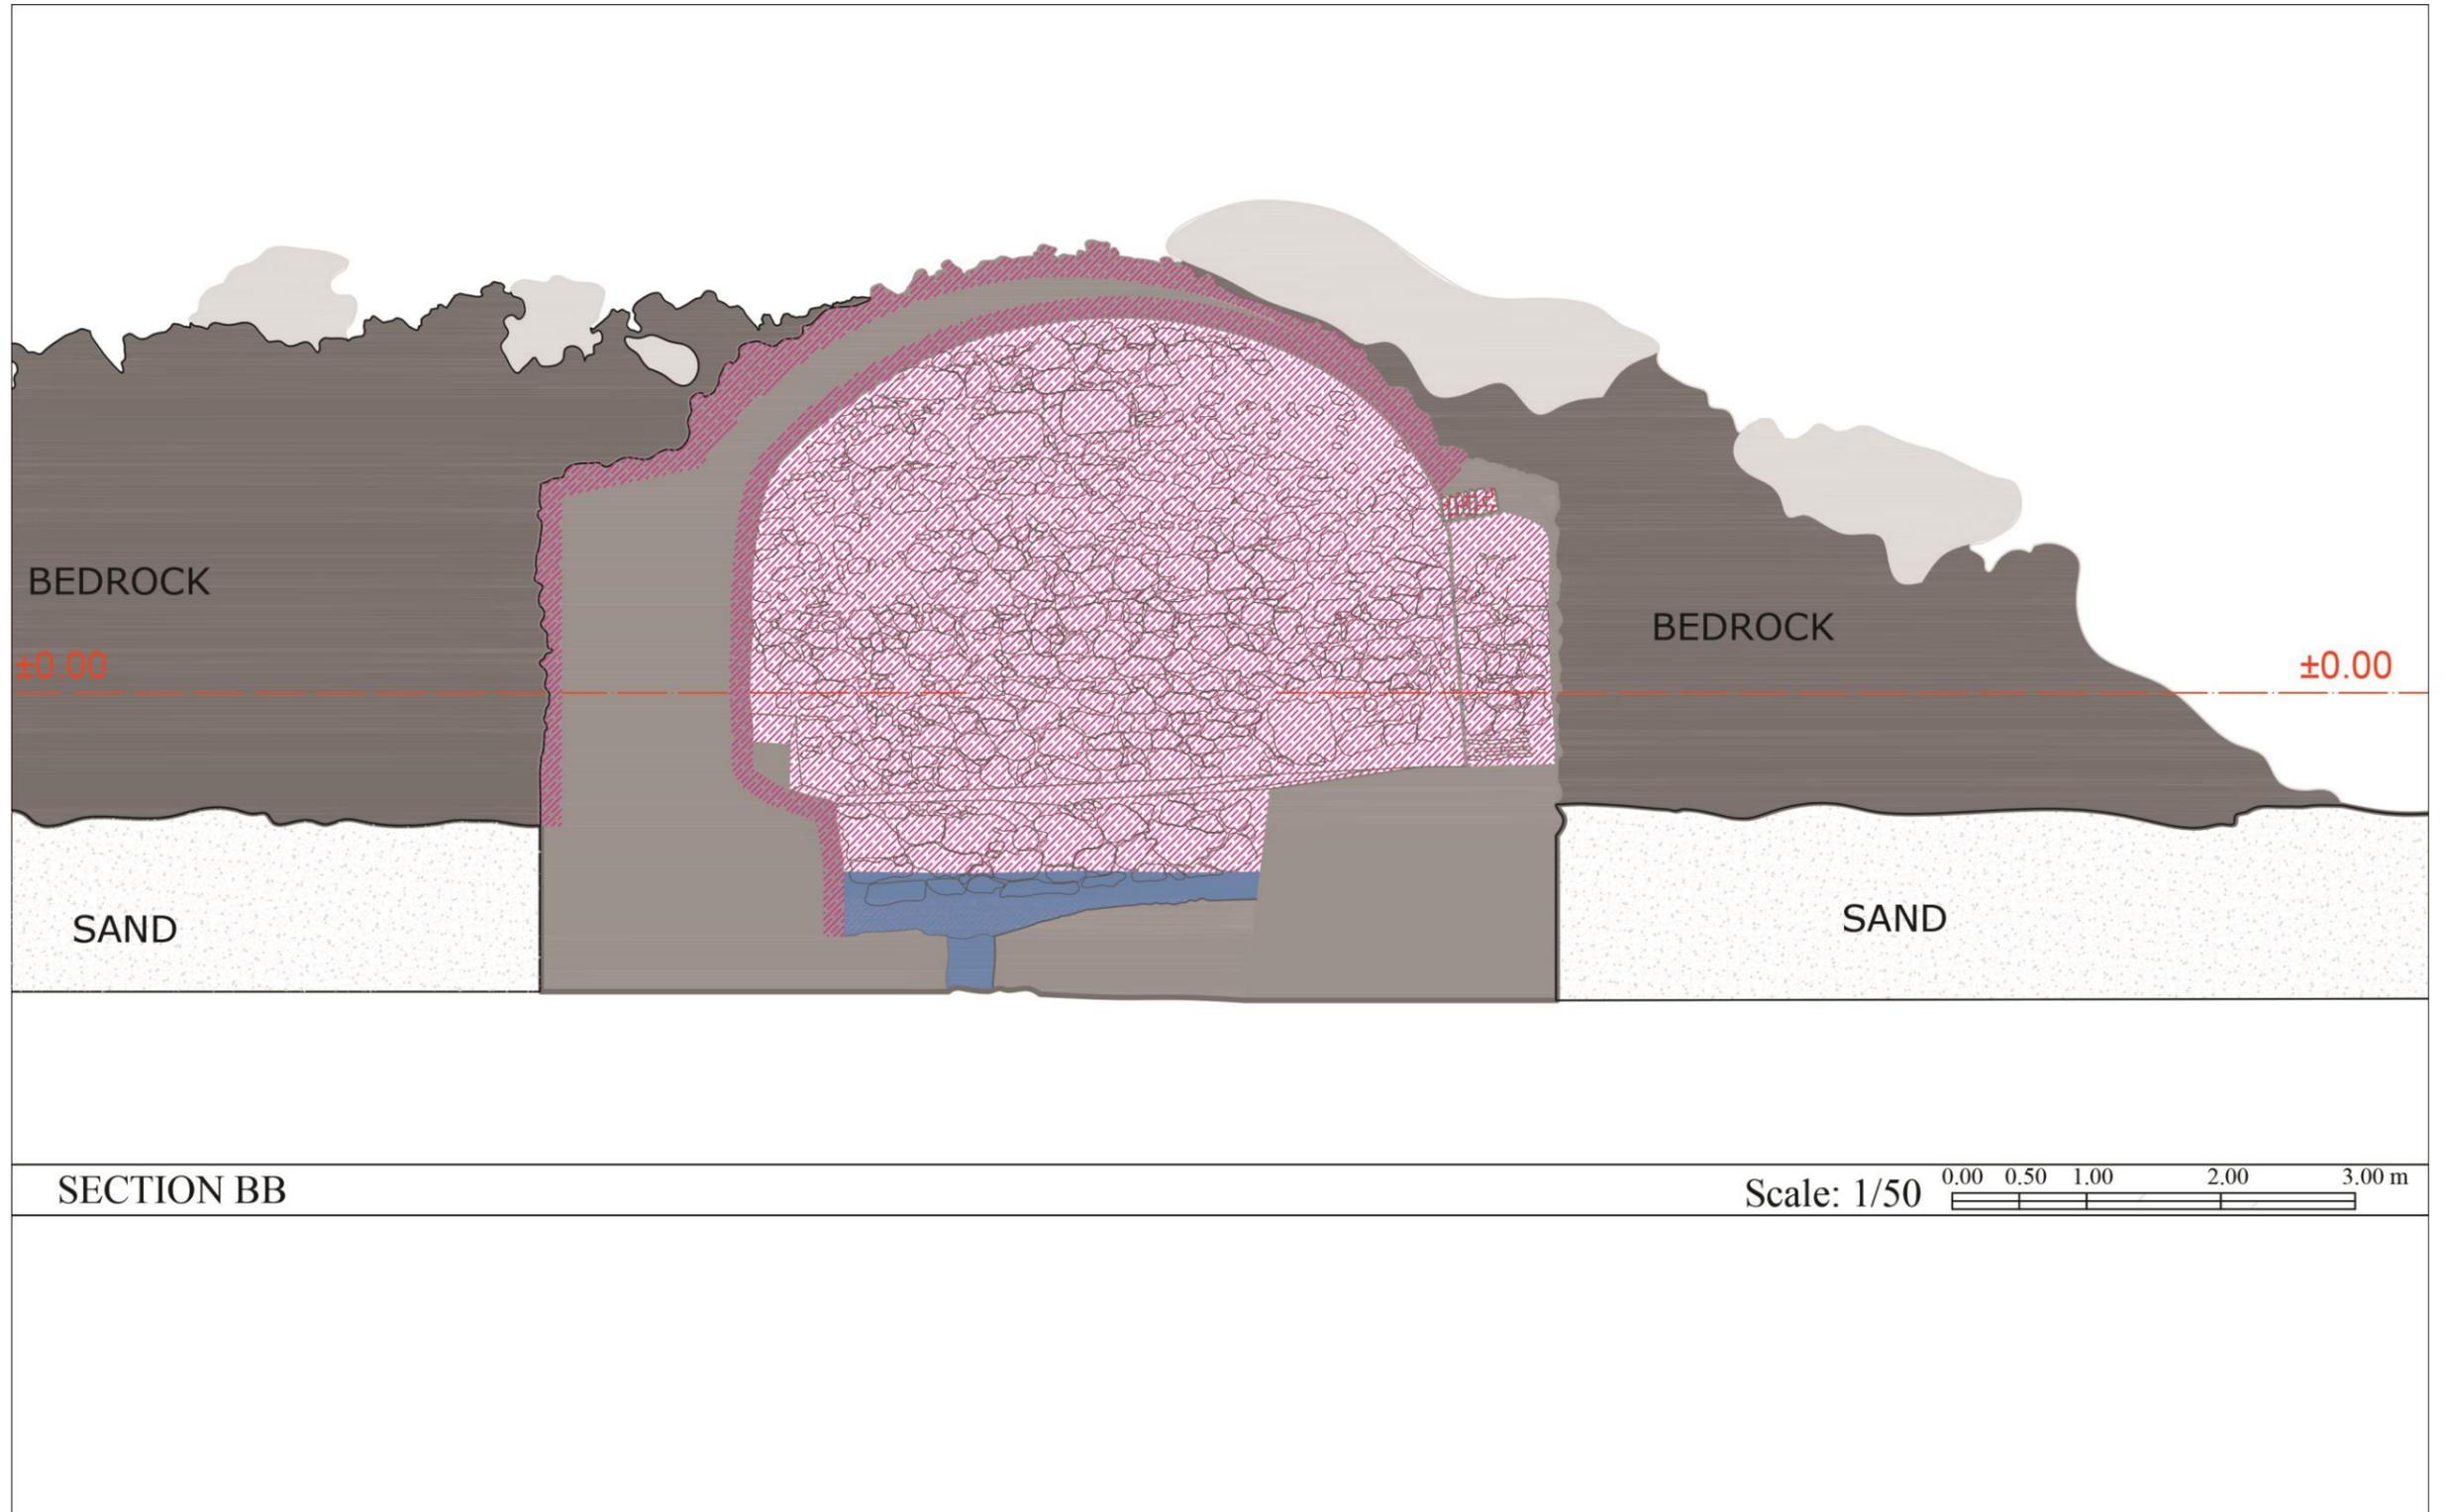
Section B - Structural Failures and Material Deterioration
